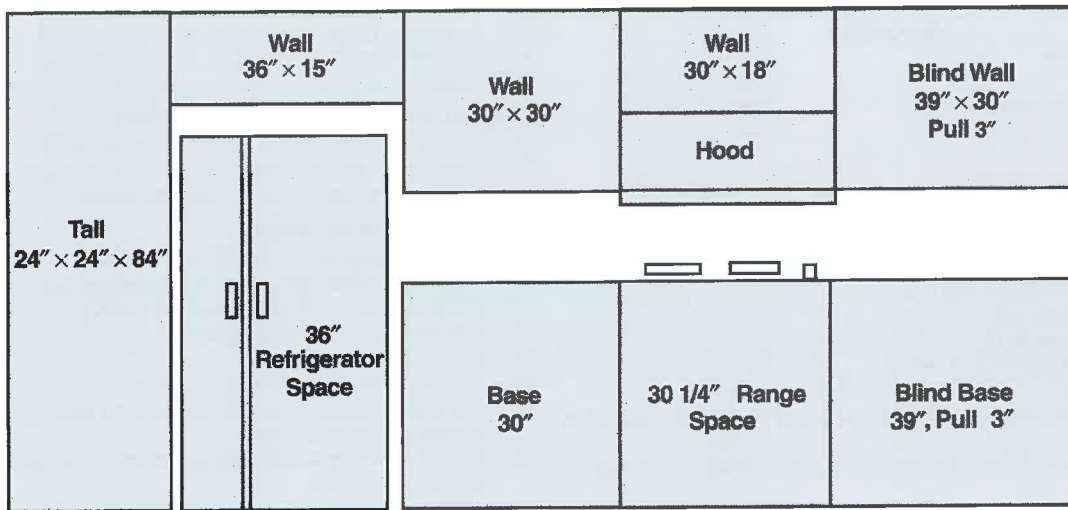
An elevation shows a *real life* view of the structure when finished. (American Woodmark Corp.)
